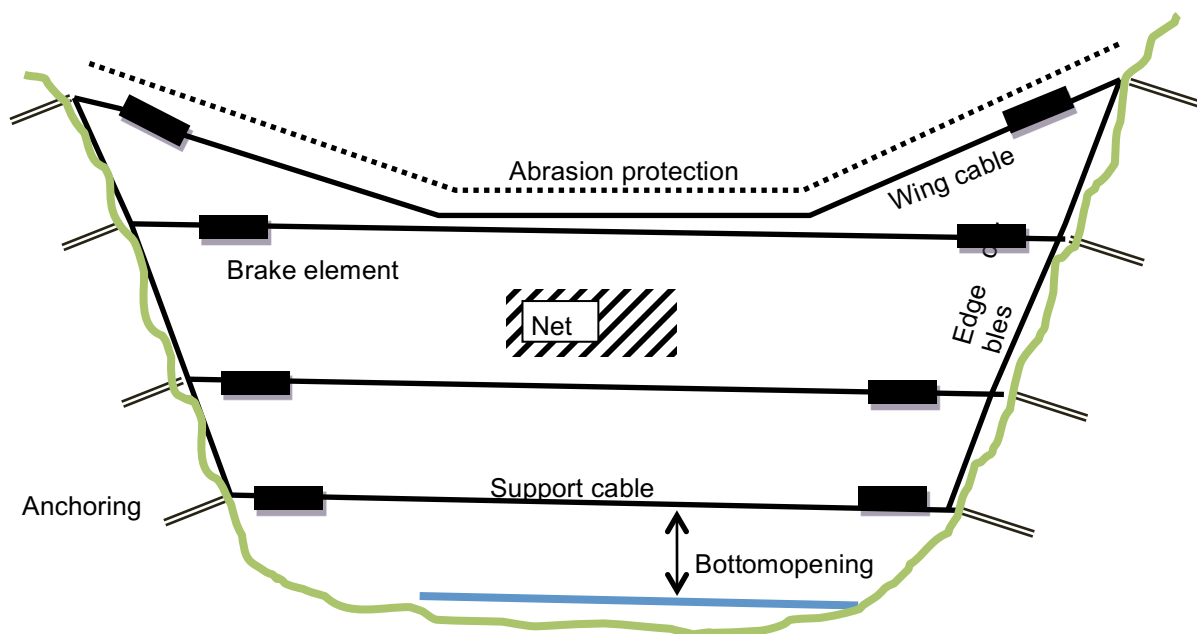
Basic arrangement of a typical flexible debris flow barrier.
